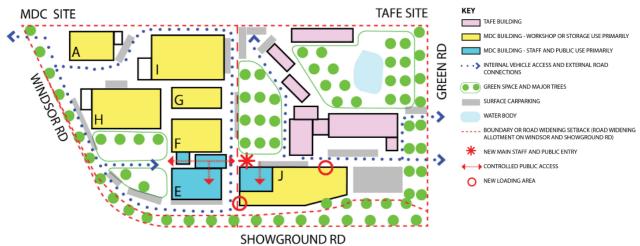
Alternative Option - Option B - Indicative site layout Source: Lahznimmo Architects
